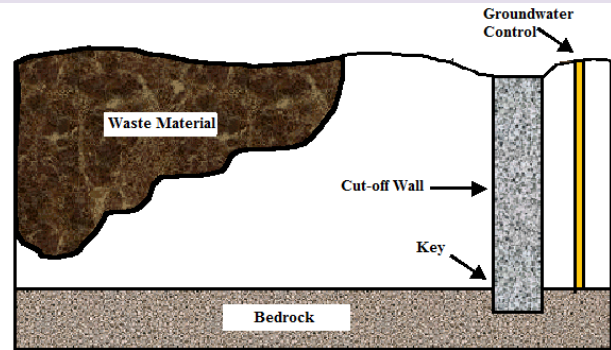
Cut-off wall with a foundation and groundwater control (Frtr, 2012 [14])
